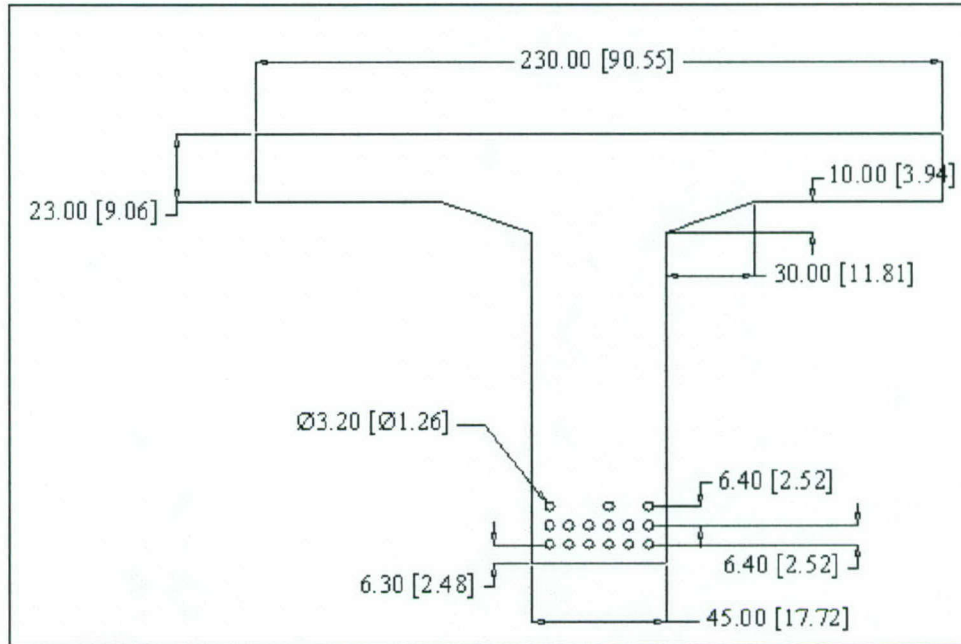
T-Girder section and tension rebars (GDH 1969) (centimeters [inches])
